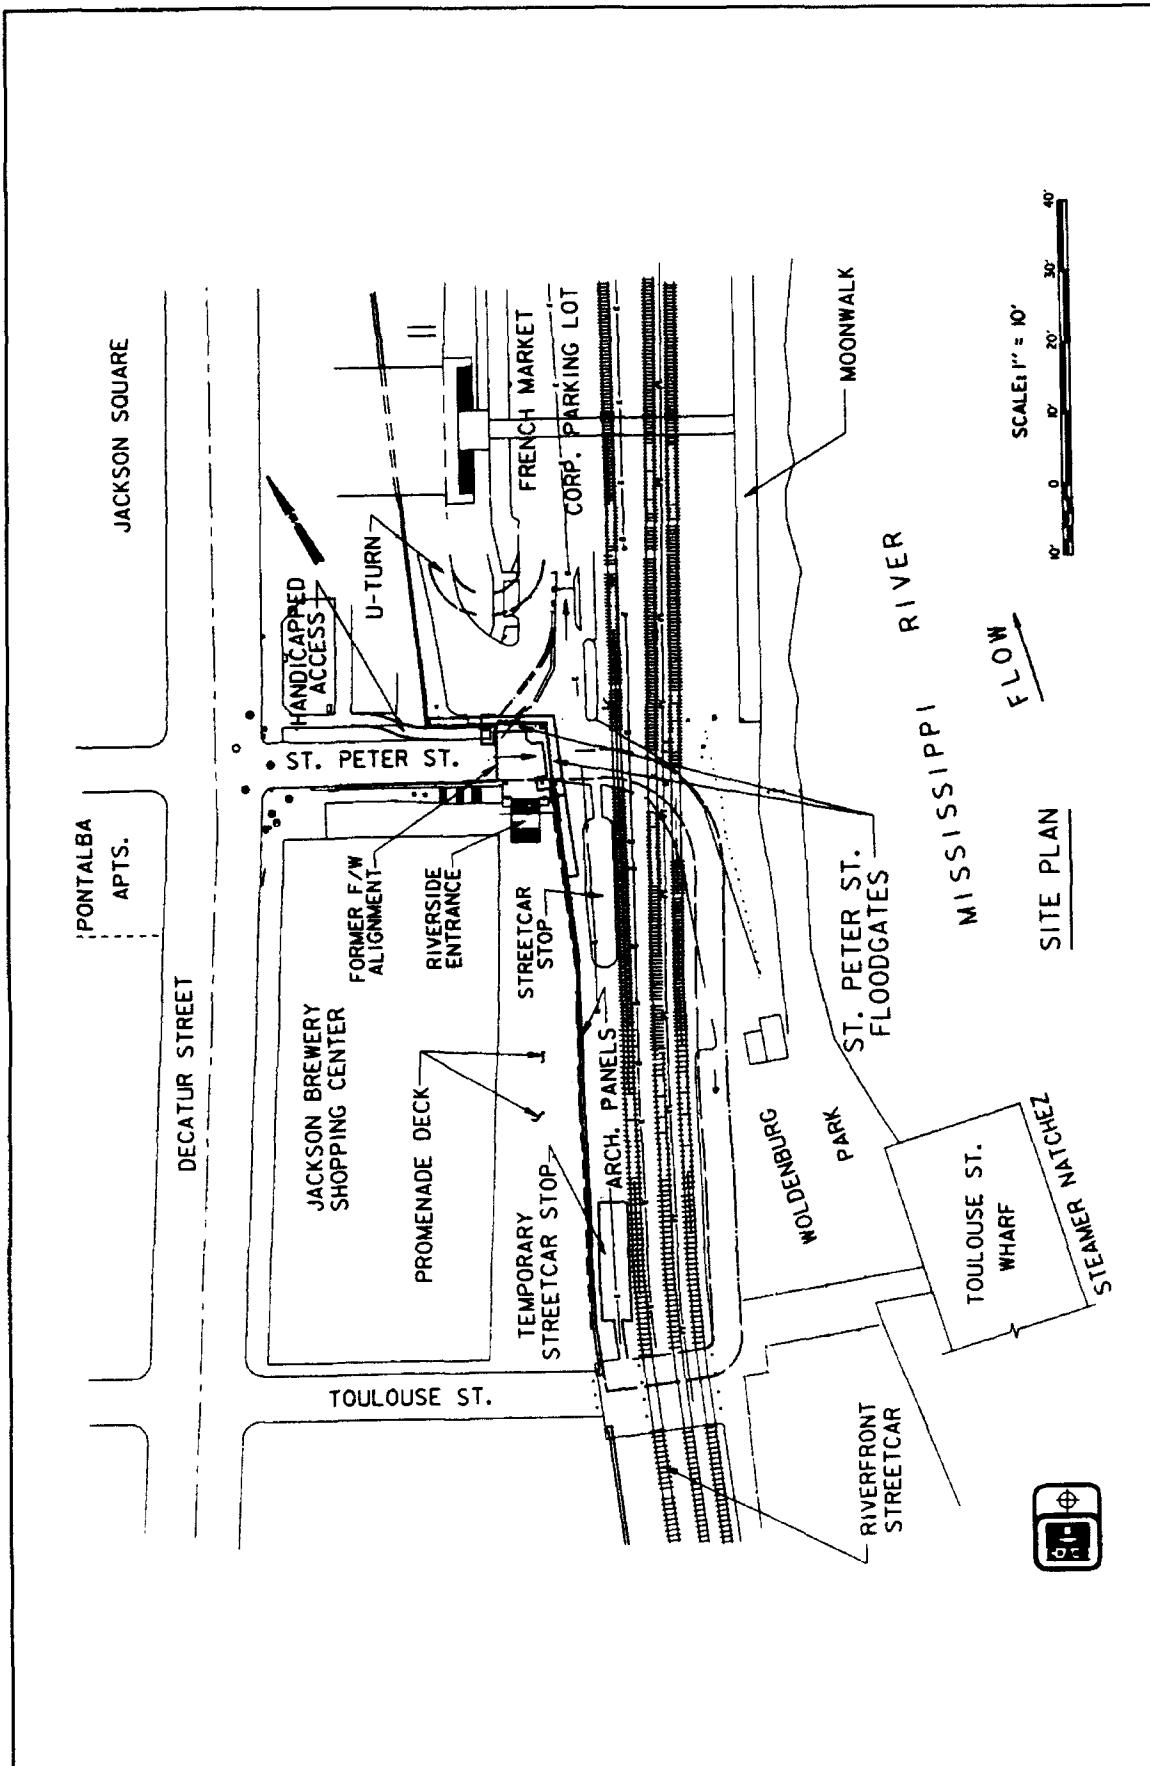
St. Peter Street Floodgates site plan, Toulouse Street to Moonwalk
